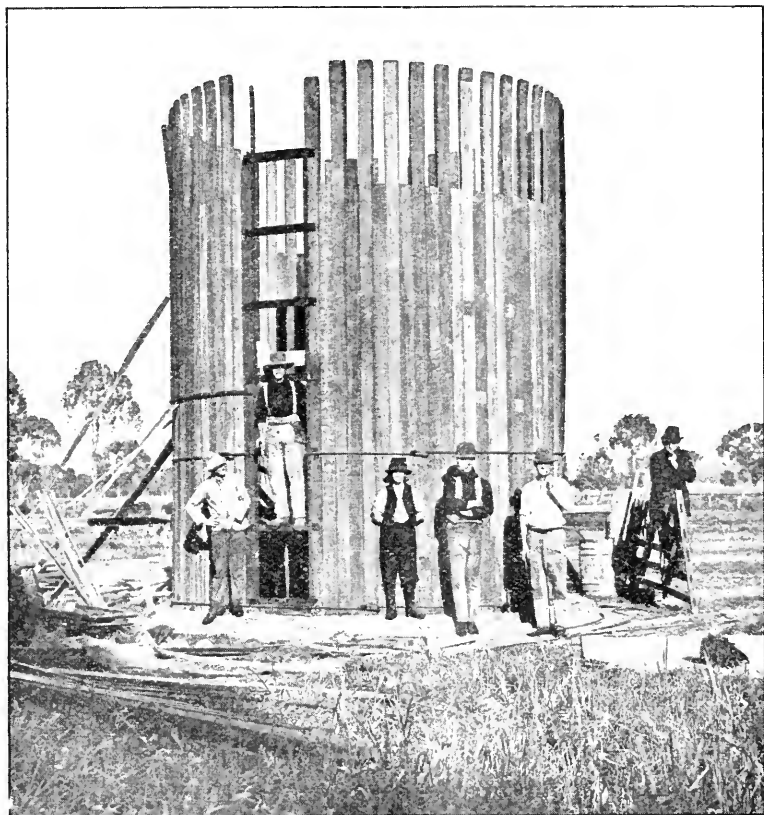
First Section of Silo. (Note each alternate joint is broken.)
